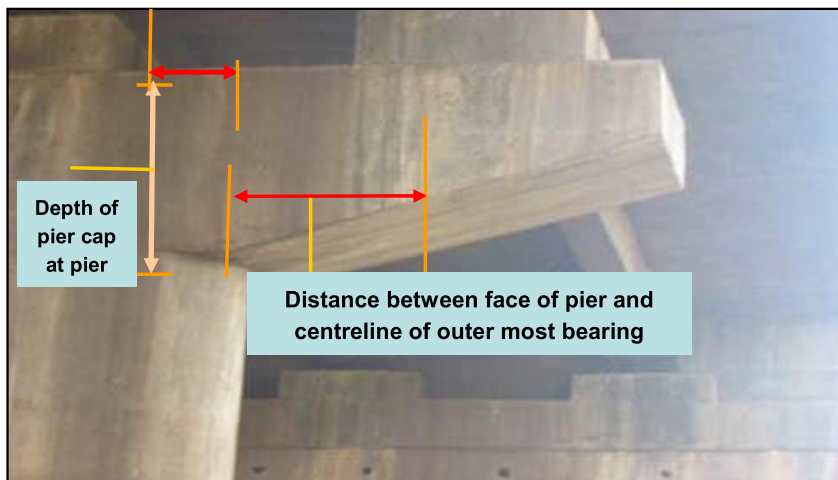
Short Cantilever Hammerhead Pier Cap
